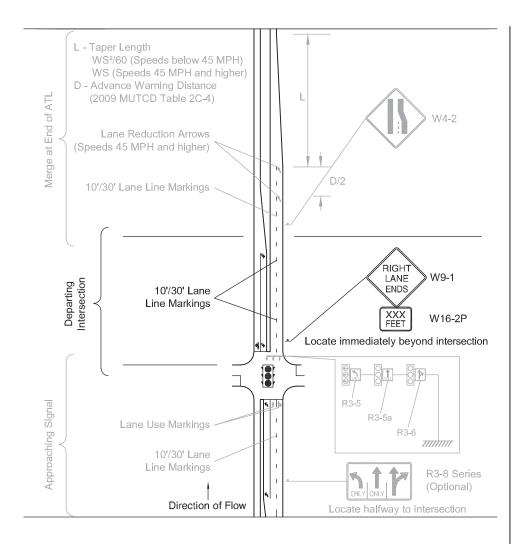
Signing and Pavement Markings for Departing Intersection Segment
